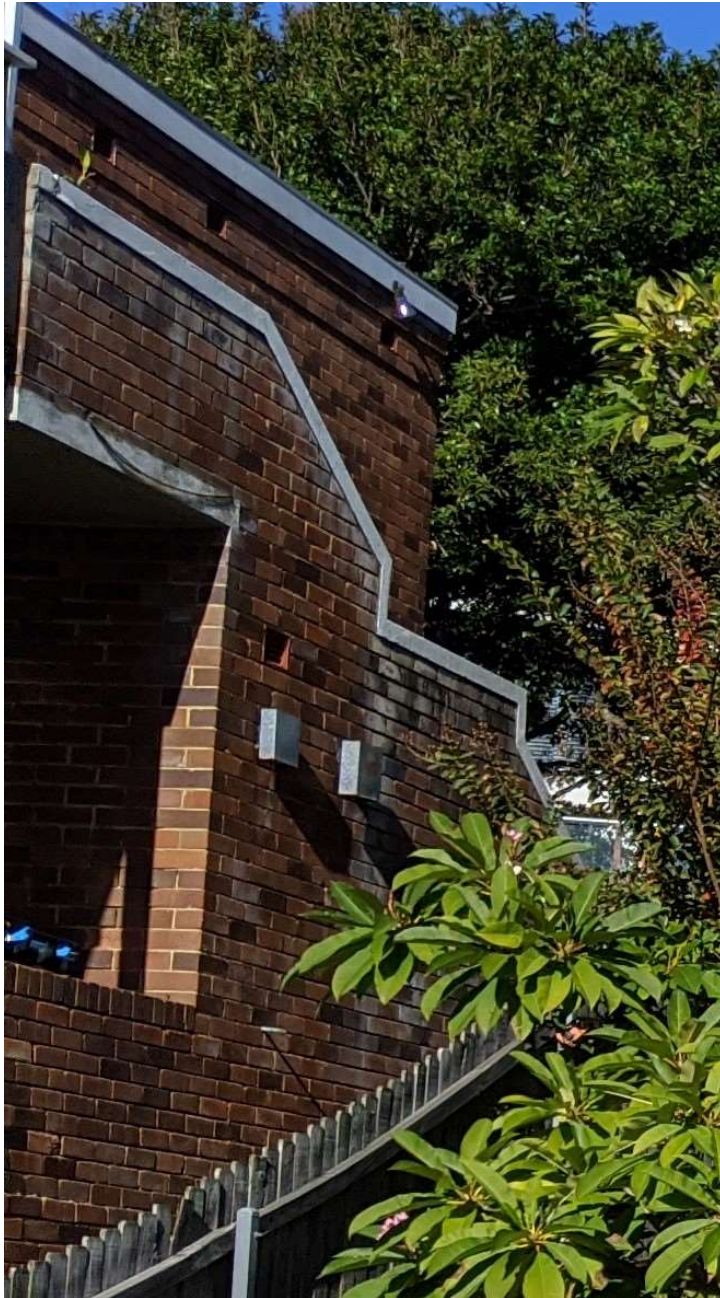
West elevation of 46 Undercliff Road with interface to proposed dwelling.
